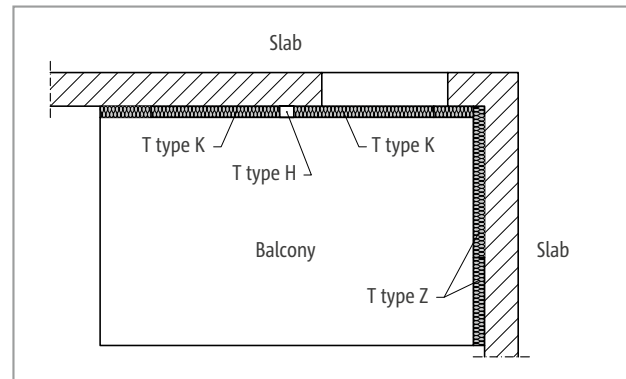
Schöck Isokorb® T type H: Cantilevered balcony
